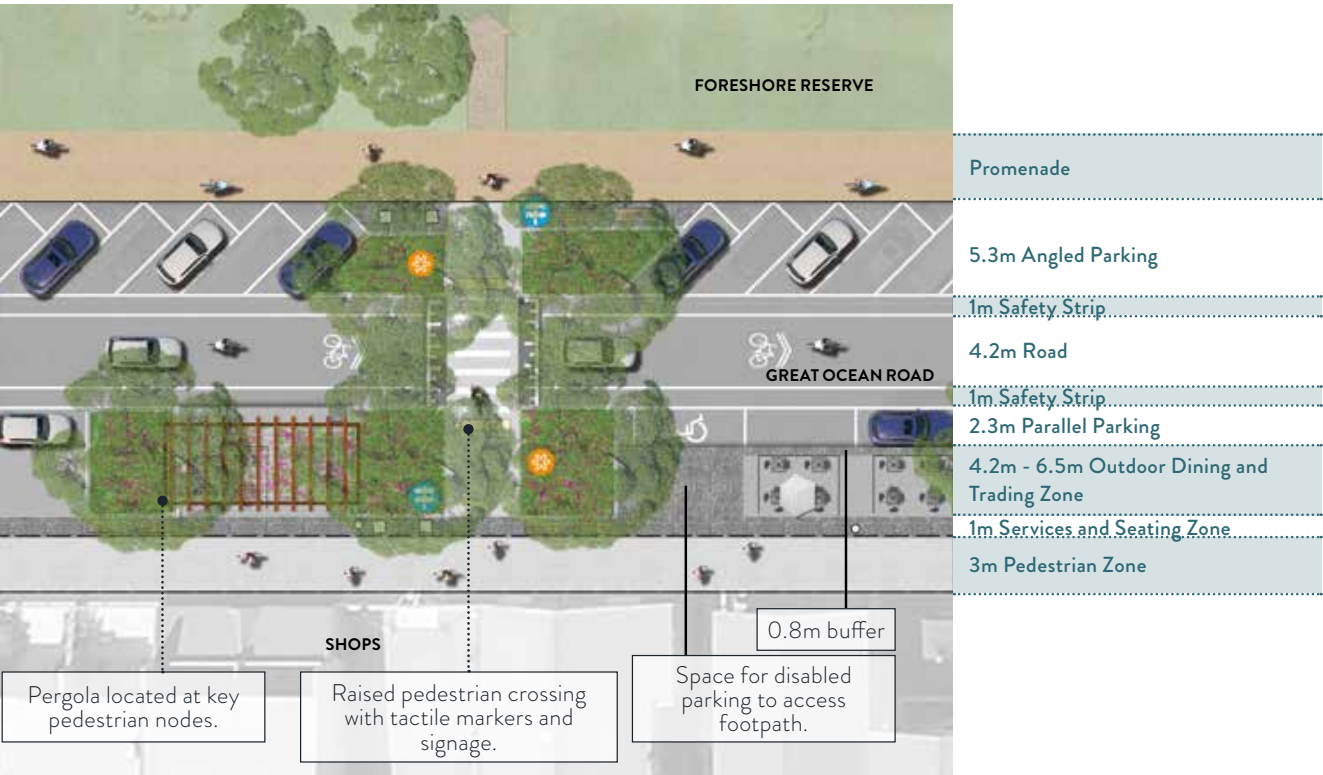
Proposed Plan - Outdoor Dining and Trading Zones - One-Way
